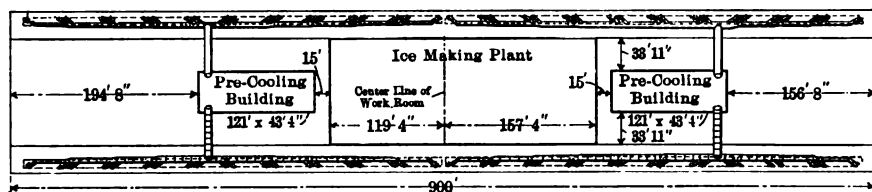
Ground plan, pre-cooling plant, Colton, Cal.—Southern Pacific.
